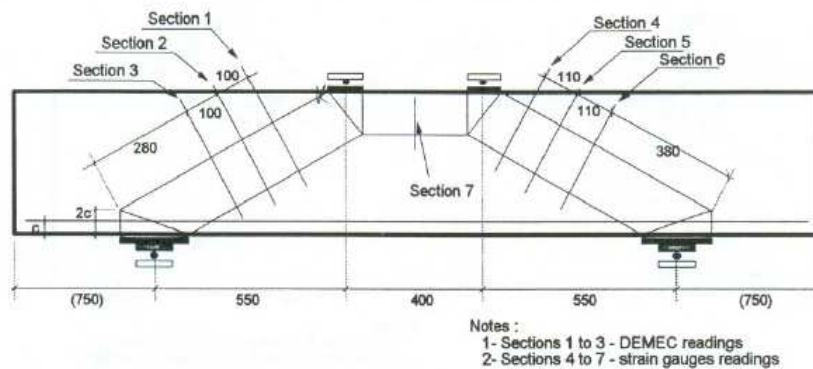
Beam 1 - Considered struts and instrumented sections
